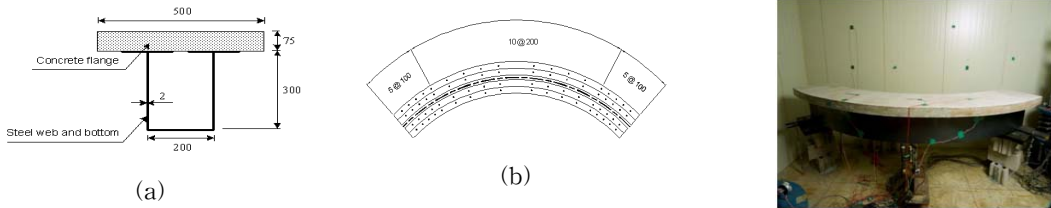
Curved composite box girder (a) Cross-sectional dimension (b) Upper dimension and shear studs (c) Test set-up
